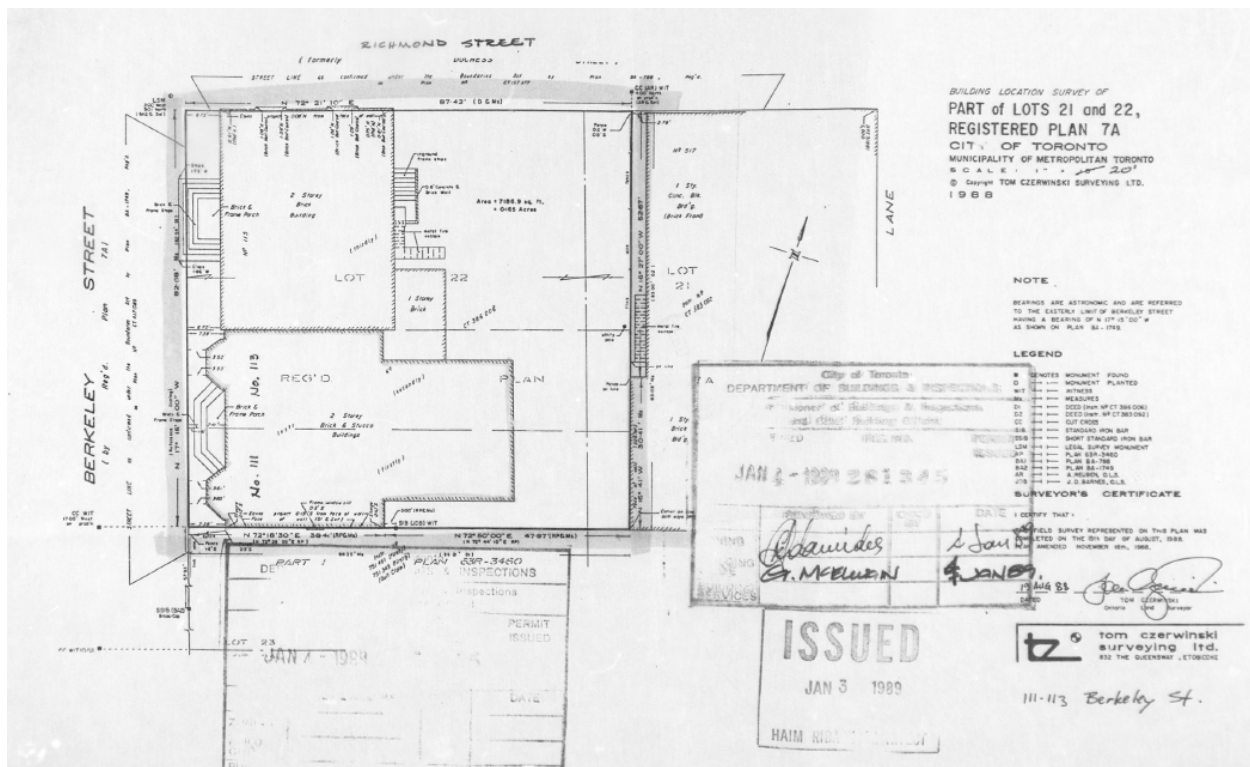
Survey of the properties at 111 and 115 Berkeley Street including the 1970s open rear stair at 115 Berkeley and the single-storey enclosed rear entry stair connecting both buildings (Building Records)
